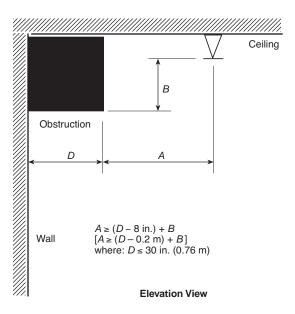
(a) Positioning of Sprinkler to Avoid Obstruction Against Walls (Residential Upright and Pendent Spray Sprinklers).
